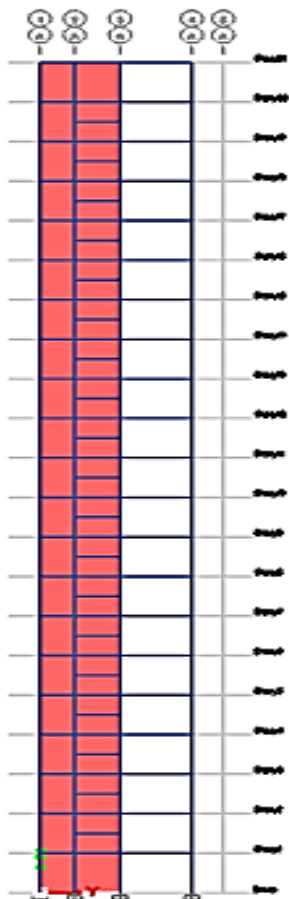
G+20 Residential Building Model: Left Elevation View with Shear Wall
